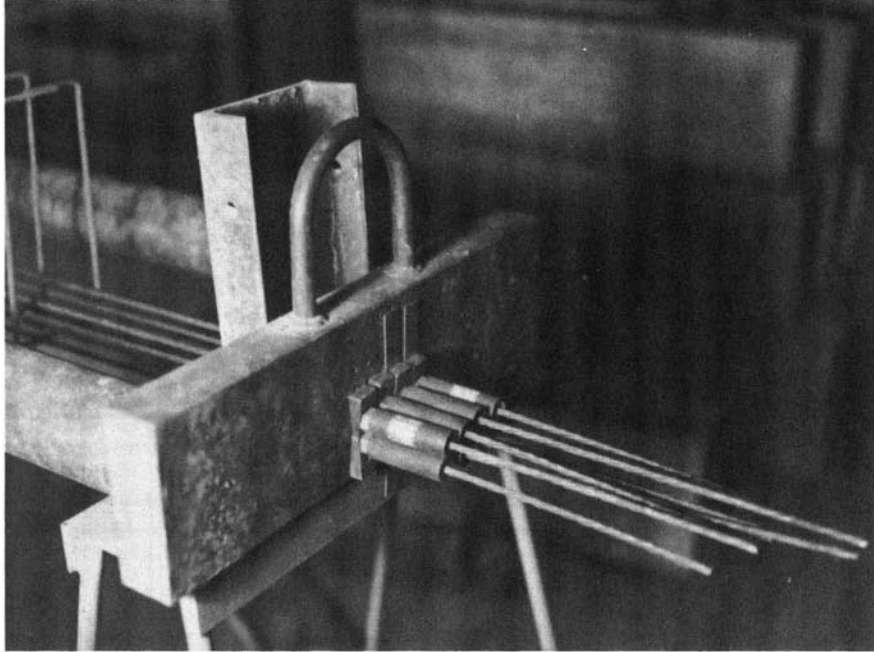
DETAILS OF ANCHORAGE FOR SEVEN-WIRE STRAND
